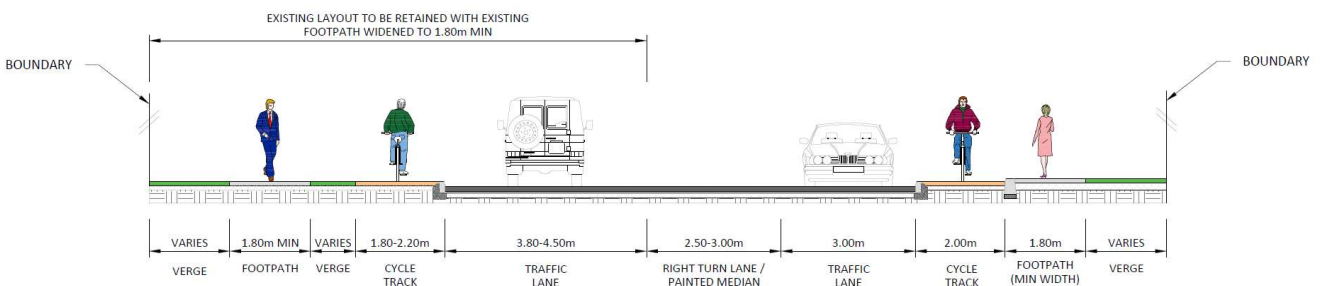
Longfield Avenue to Heywood Road - Typical Cross Section
